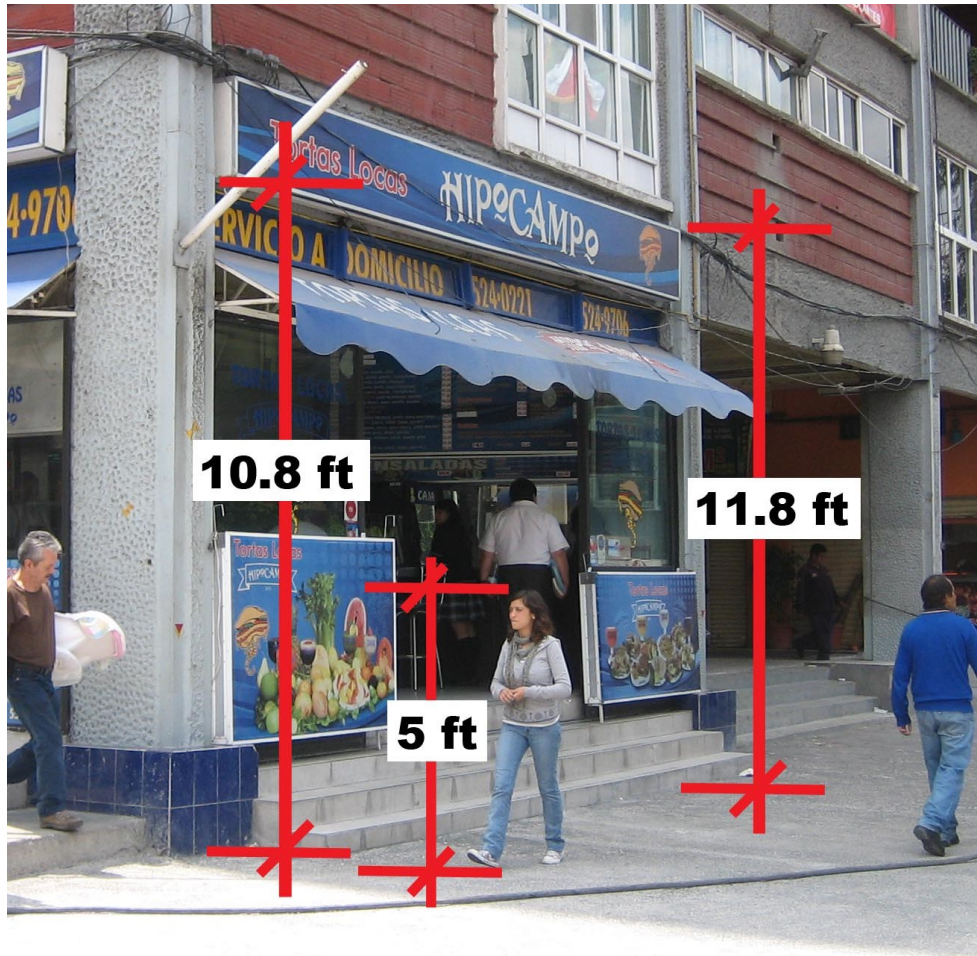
Detail to Calculate Floor-to-Floor Height on the Façade for the Grocery Store. (Photo by Jose Luis Bermudez Alcocer).
